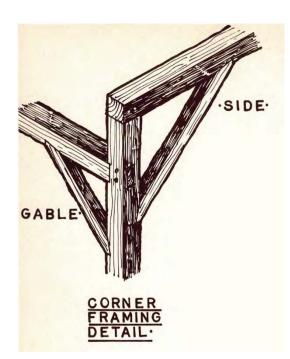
Framing technique used at Turner House, where the posts of the "bent" are load bearing and the plates are either at the top of the kneewall ("side") or support the floor ("gable") (from Rempel 1967:108). Partitions and wall sections within this framing were formed from non-load bearing vertical studs and cross-braces.
